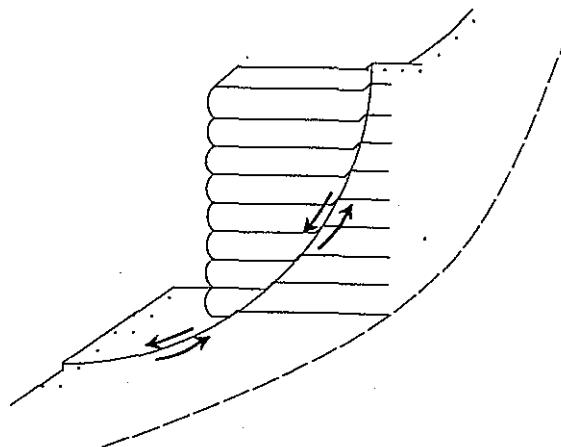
Stability of an "extensibly reinforced" structure built on a slope.
